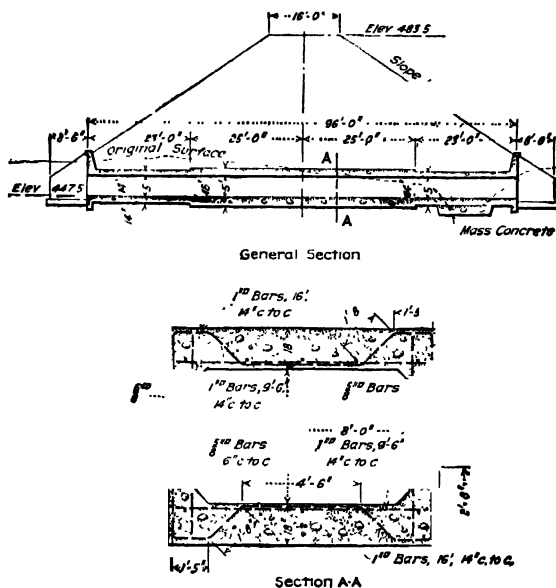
Details of box culvert on lines of Eastern-Texas Traction Co.
